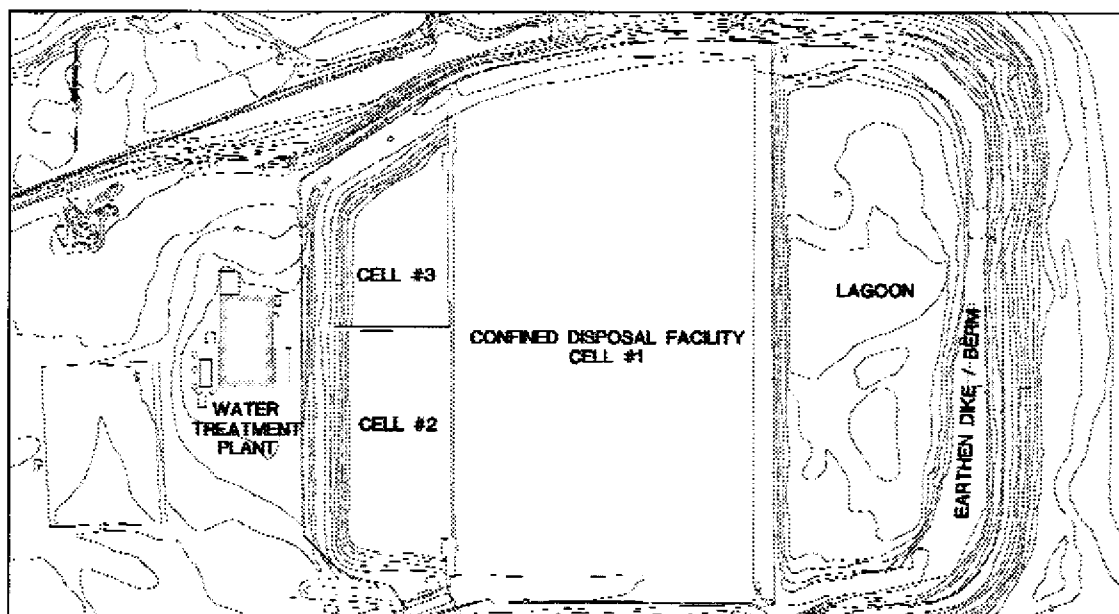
The layout of the existing water treatment plant at the New Bedford Harbor Superfund site.
